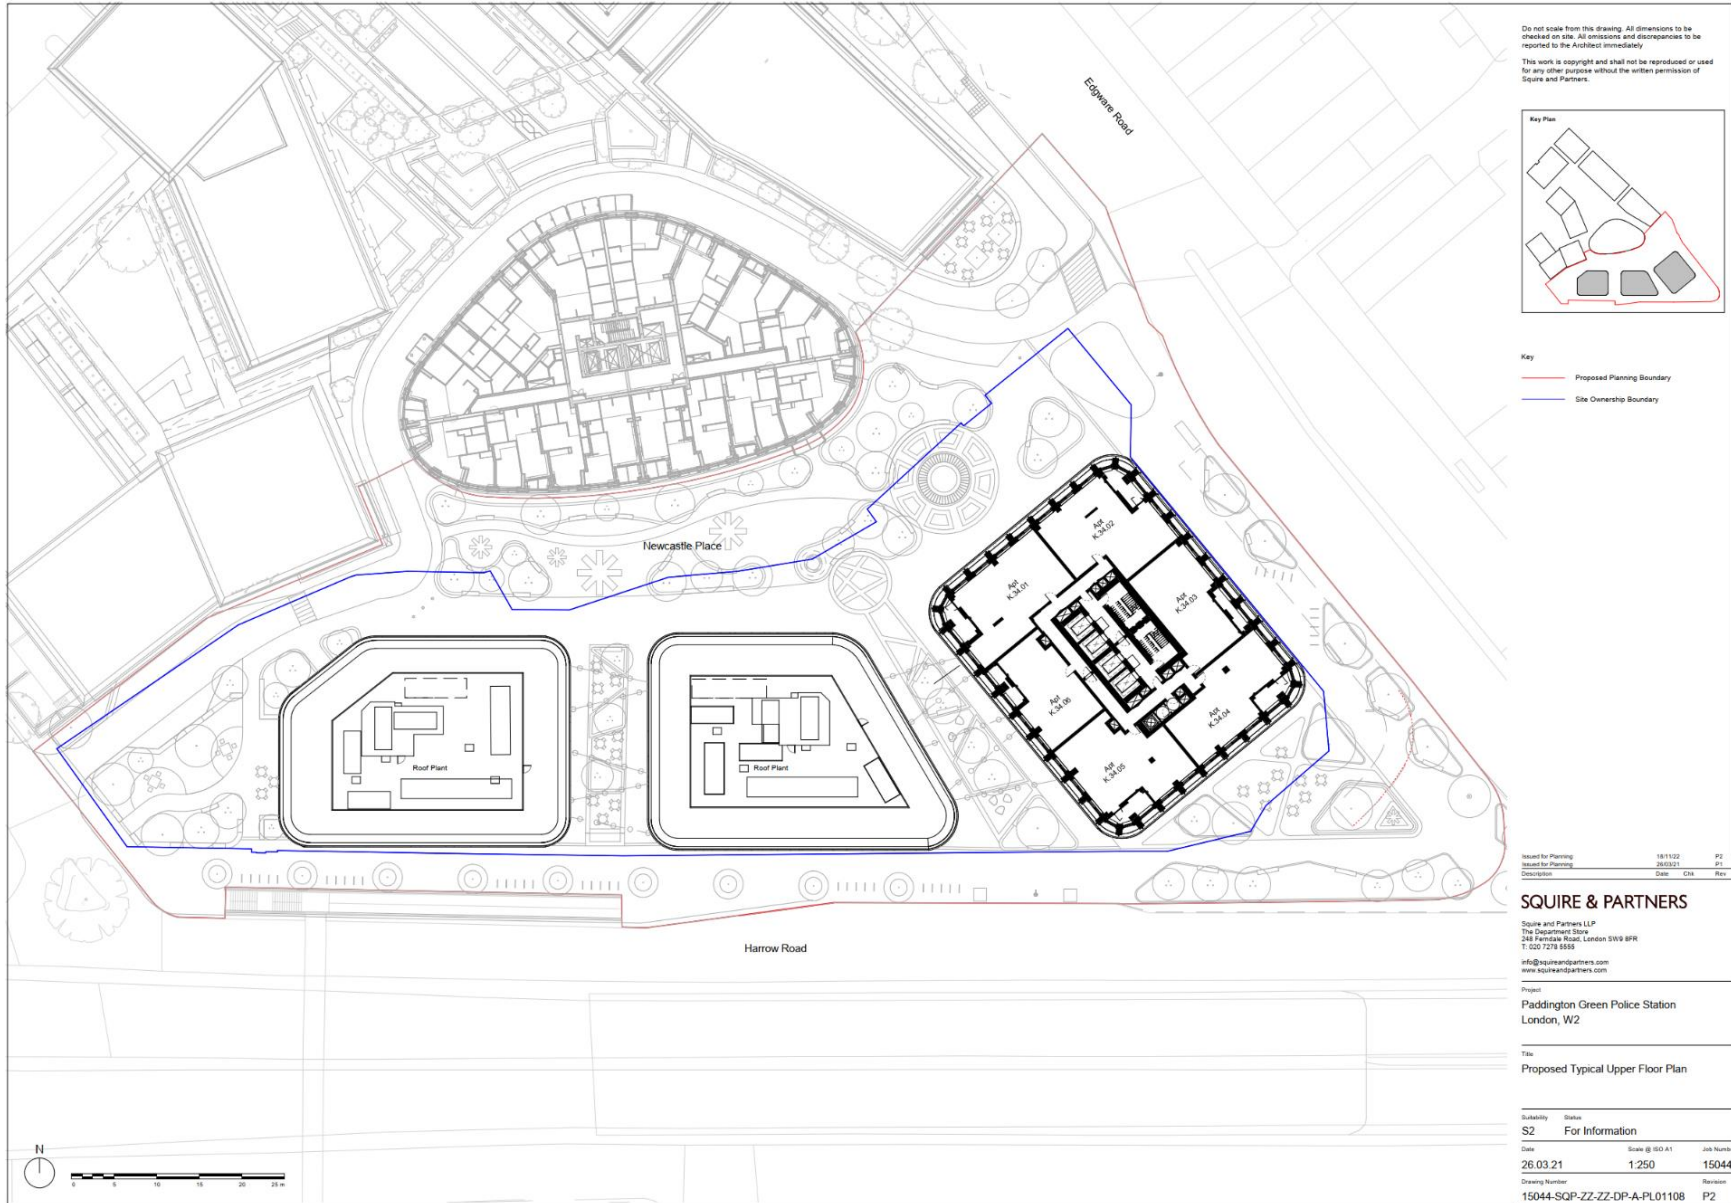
2022 Amended Proposed Development Typical Upper Floor Plan
